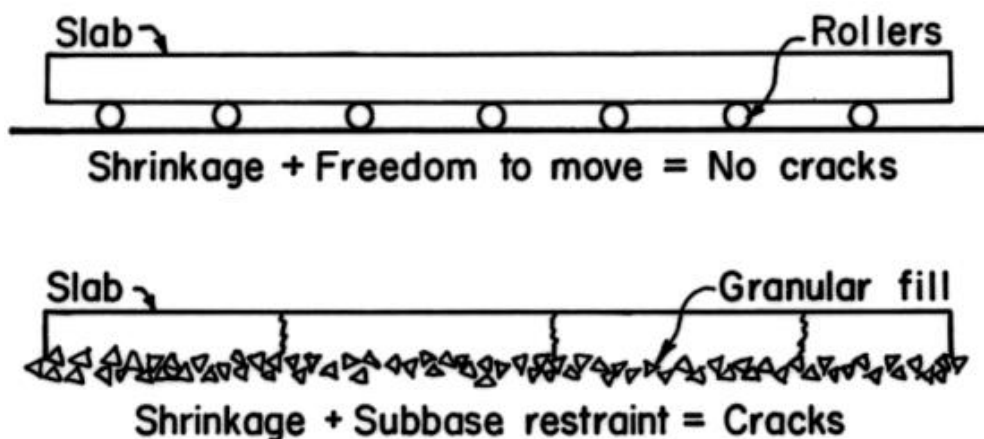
Movement joints and how they prevent drying shrinkage cracks
